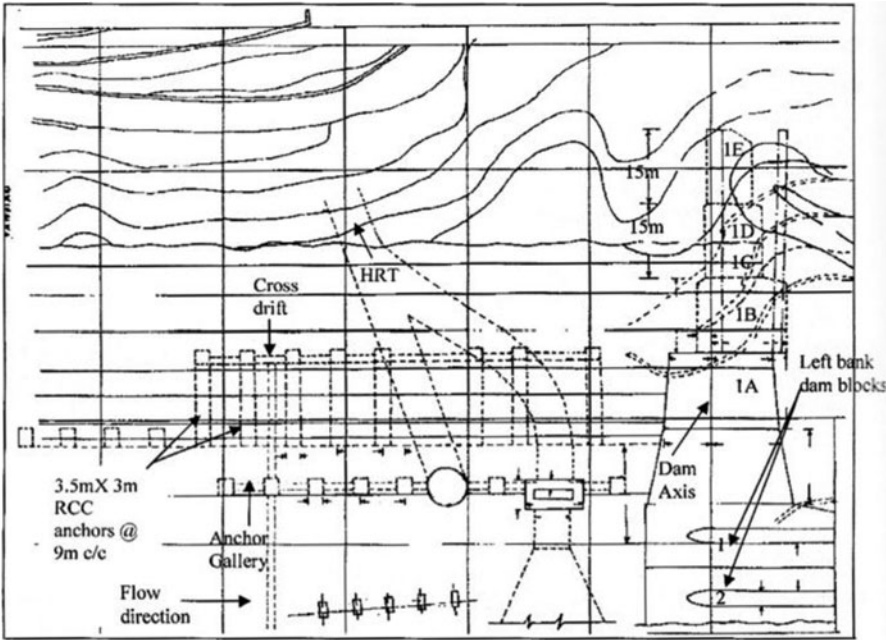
Plan showing concrete anchors (Ichari dam area).
